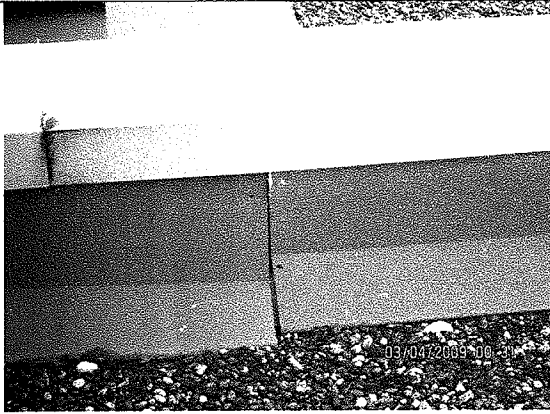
Here we have a piece of wall flashing that needs to be properly secured.
